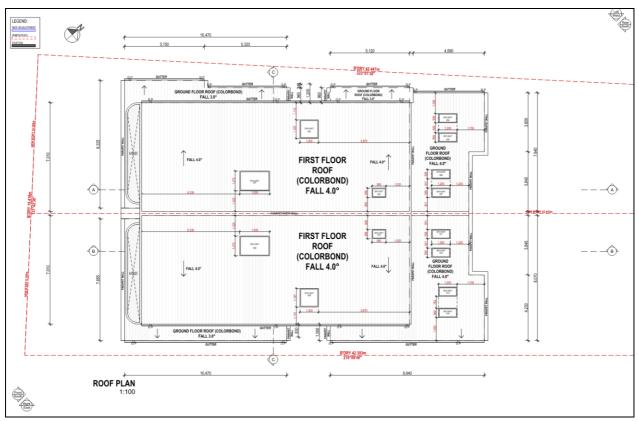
Proposed Roof Plan (Source: VD&D, 2025)
